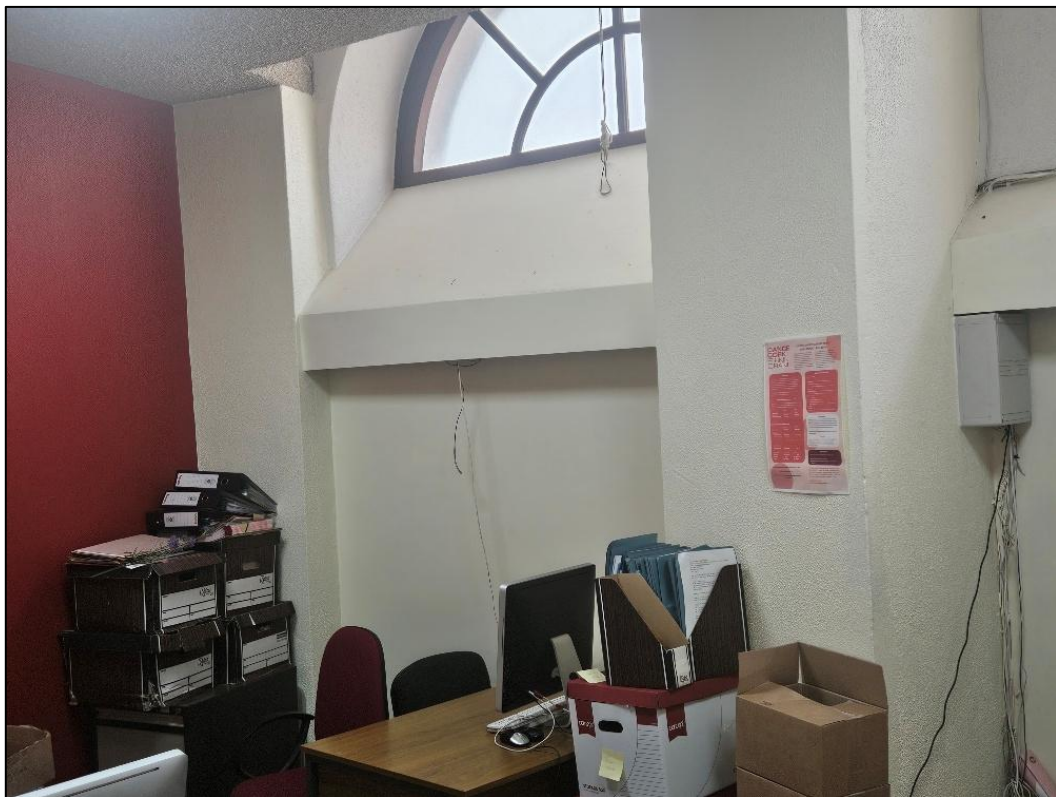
Board room relocated and this are to be developed as café al perimeter walls to be dry lined with breathable insulation and windows upgrade
